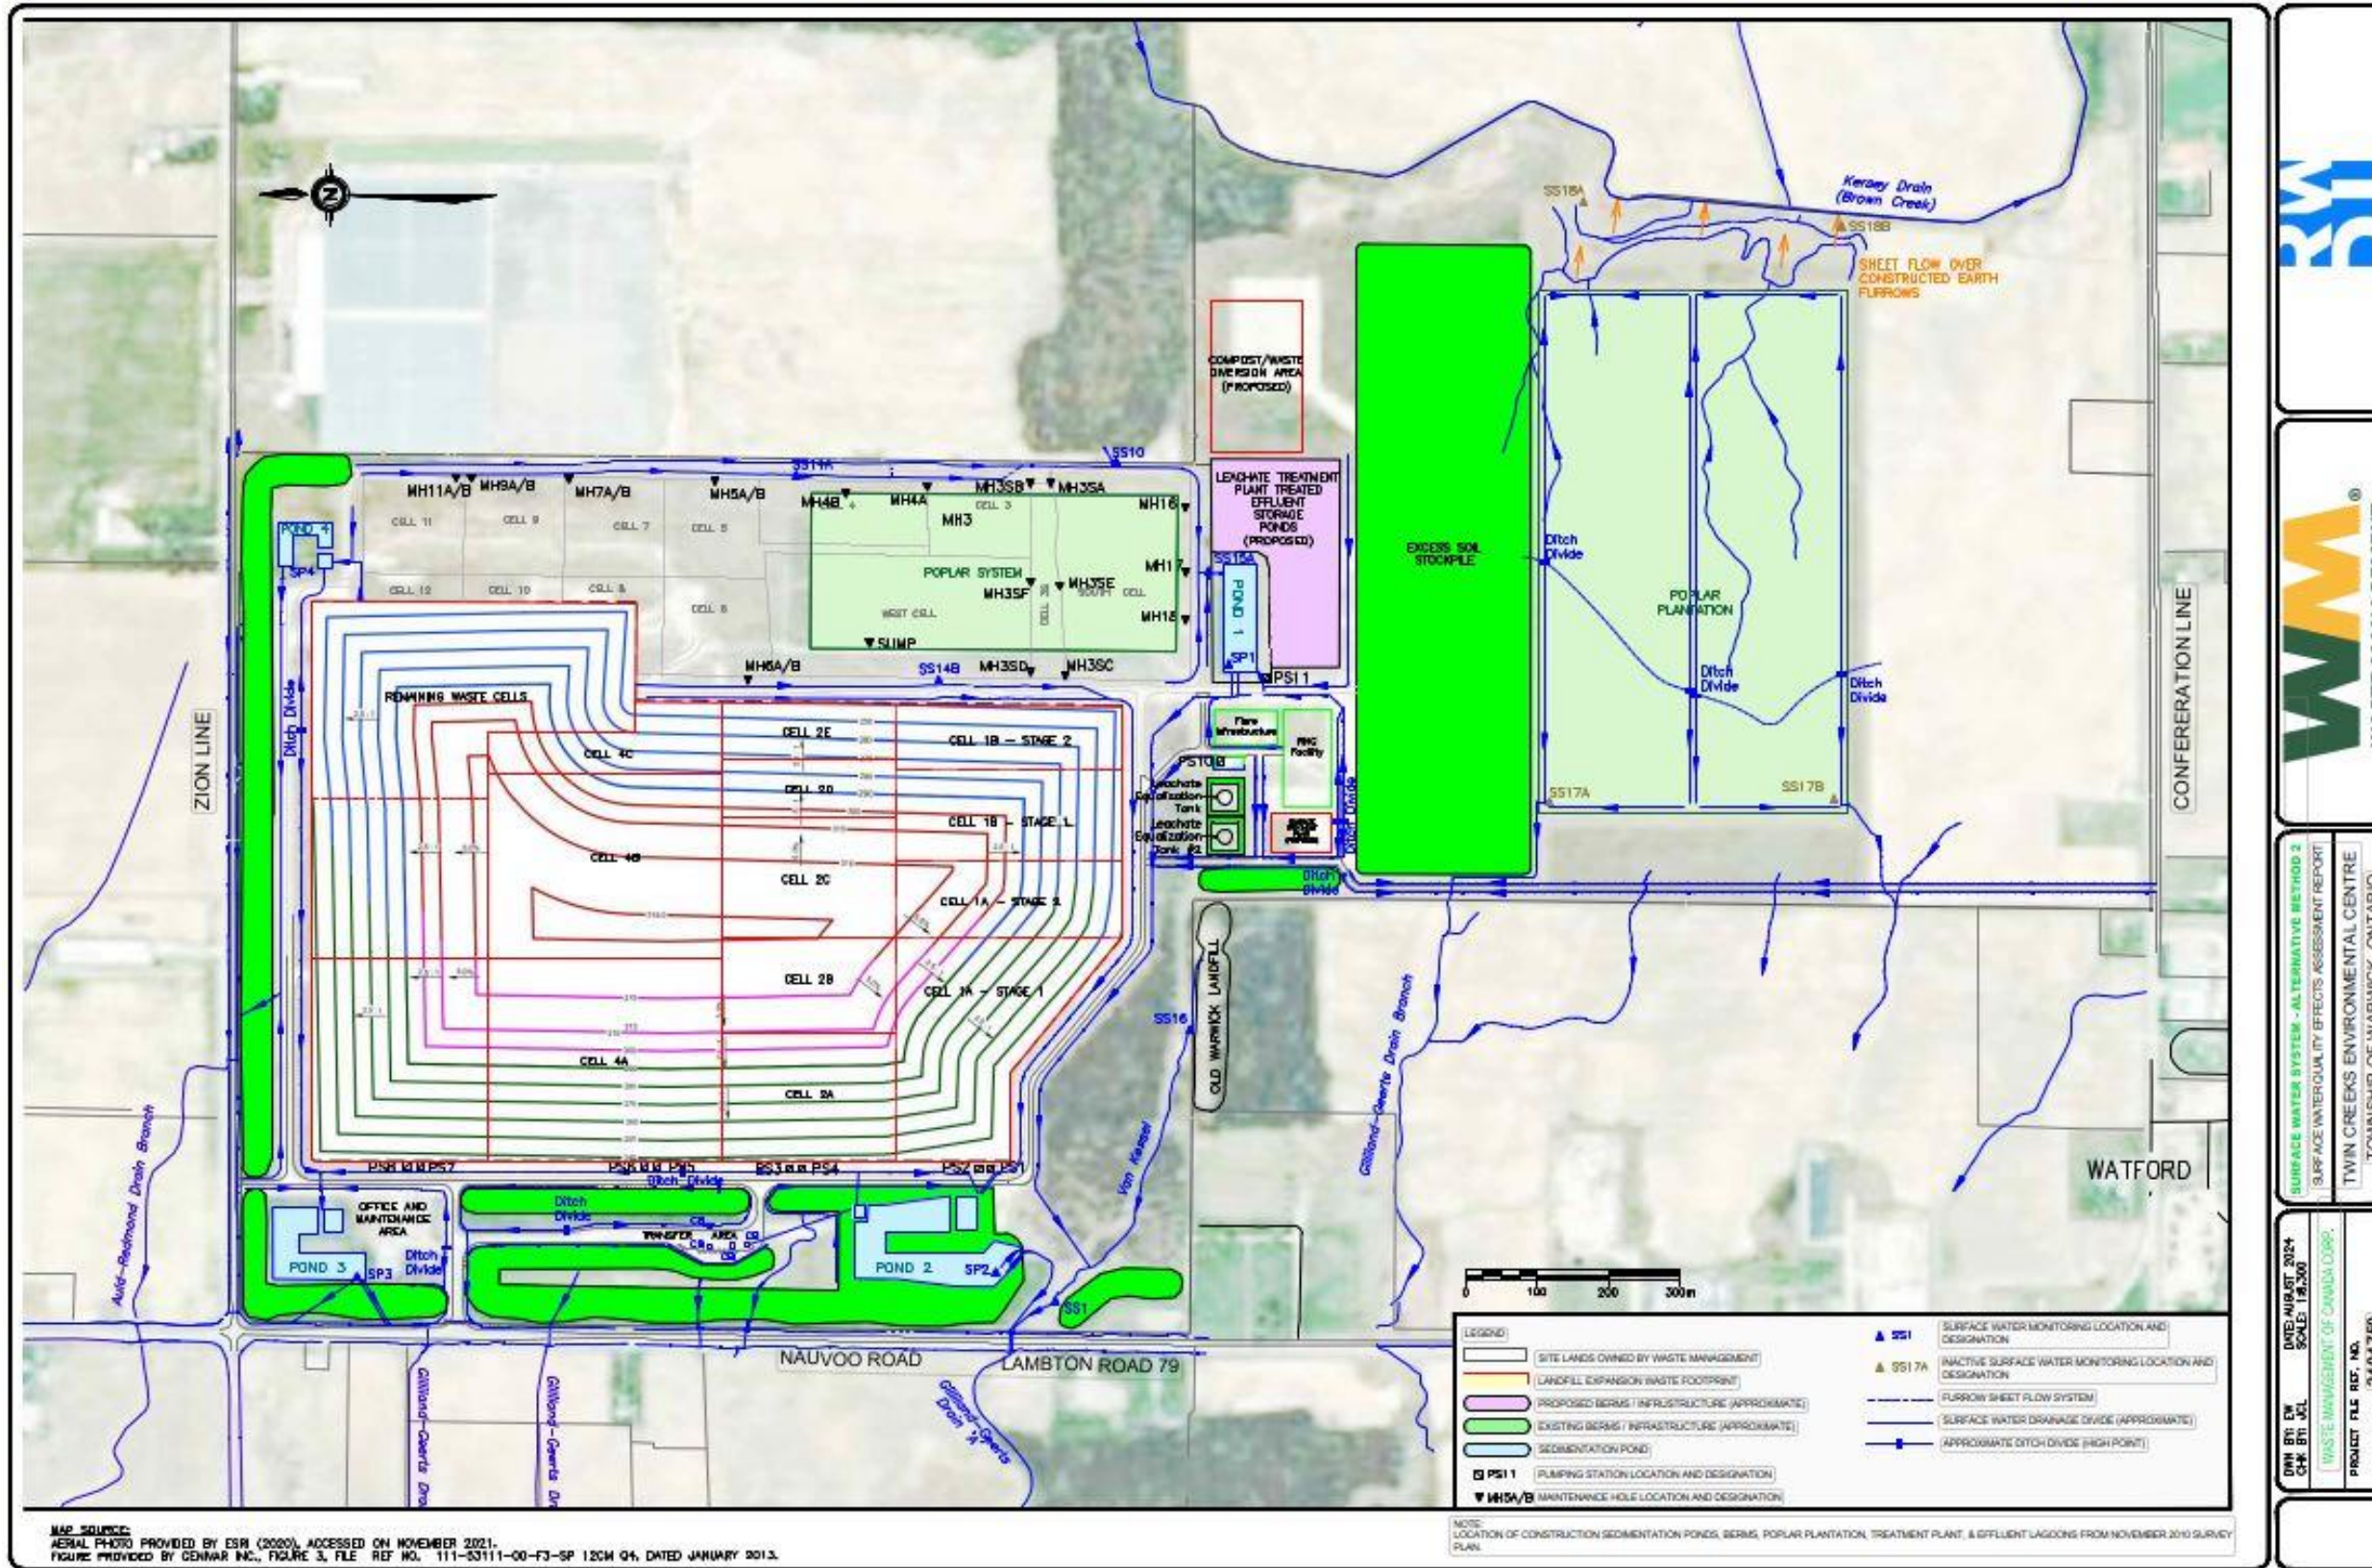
Alternative Method 2 Proposed Landfill Contours on Surface Water Drainage Network Site Plan
